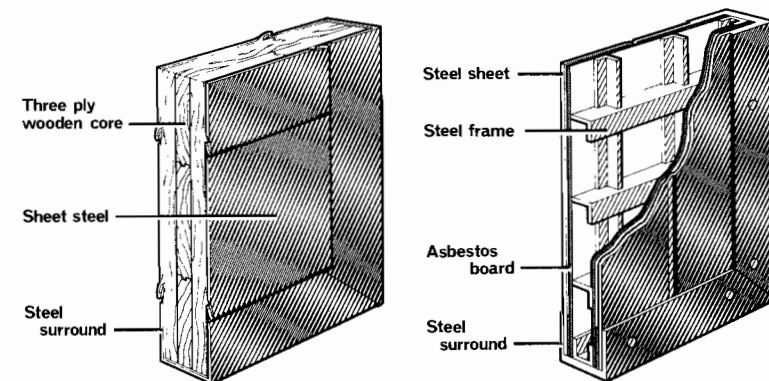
Two types of steel door. Left: steel-covered on wooden core. Right steel-covered on steel frame lined with asbestos.
